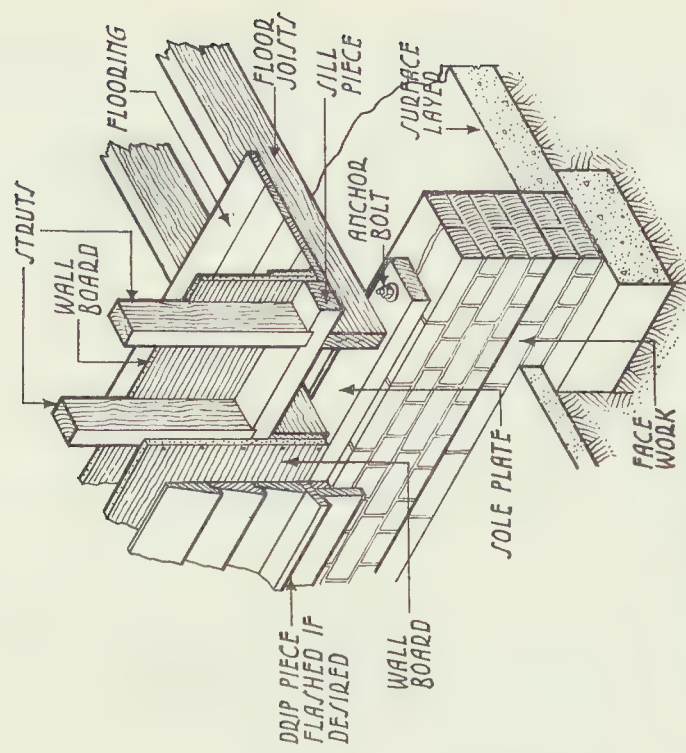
TIMBER-FRAME CONSTRUCTION IN CONJUNCTION WITH A TIMBER GROUND FLOOR
